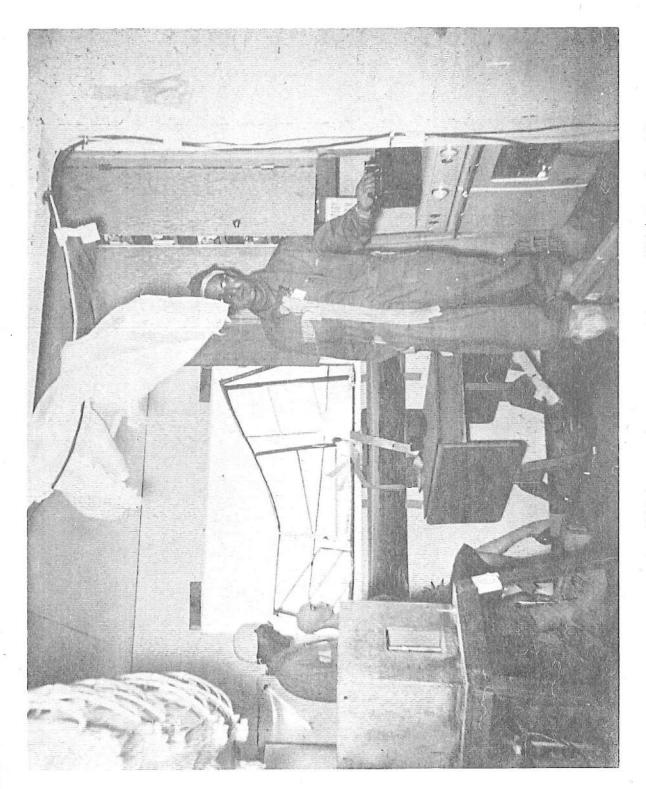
,12-Postshot view of kitchen area in precast concrete house at 4700 ft from Ground Zero.
